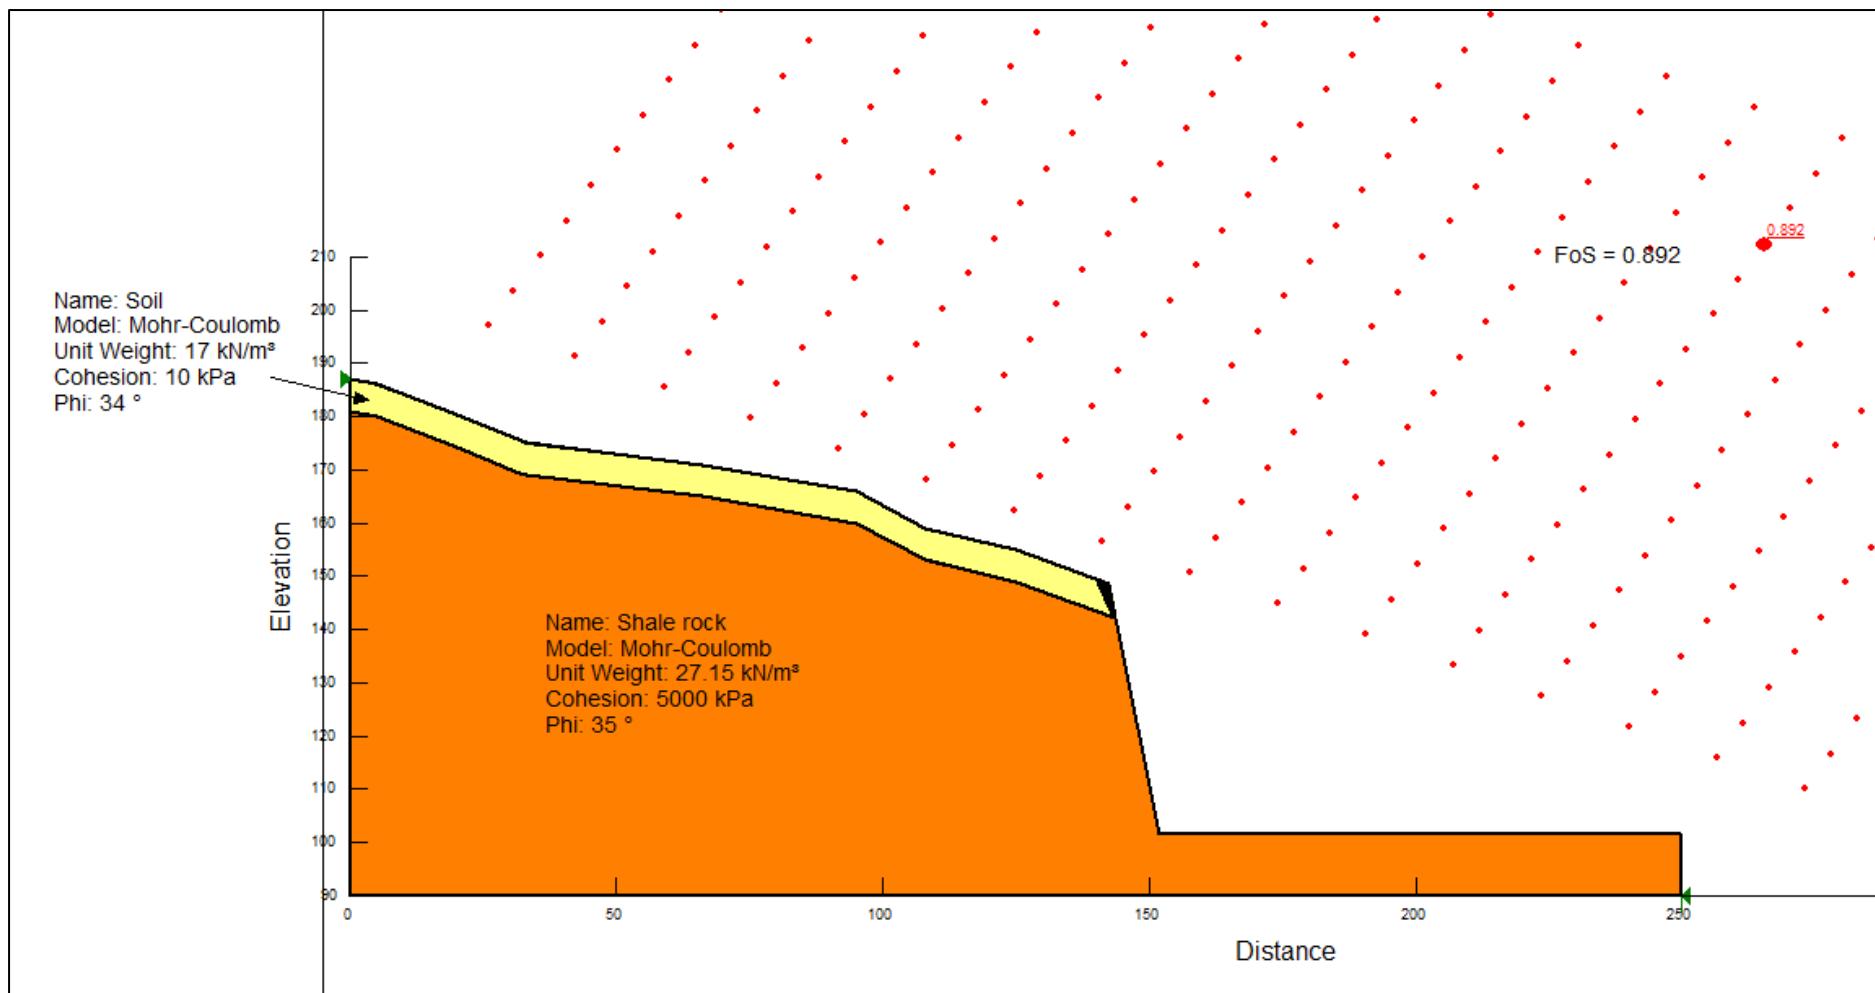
E.16: Outlet portal, Section 1, 1:0.2 excavation slope in shale, 1:2 excavation slope in soil
